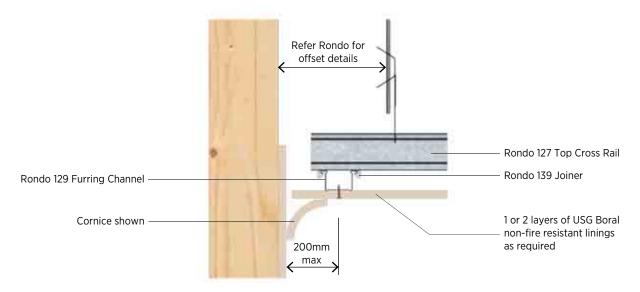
Typical Perimeter Detail - Section Through Furring Channel
